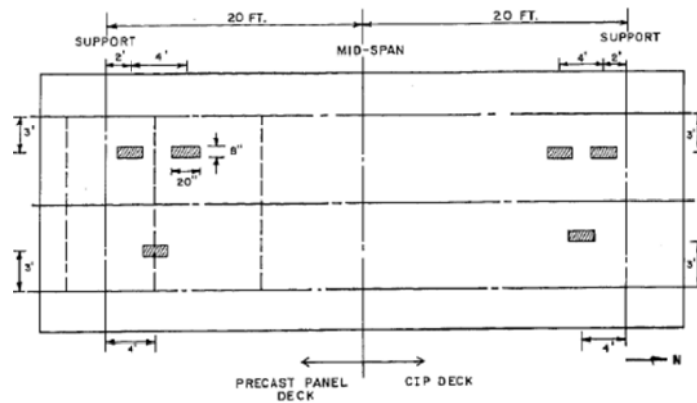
Plan view of test specimen. (Fang et al., 1990)
